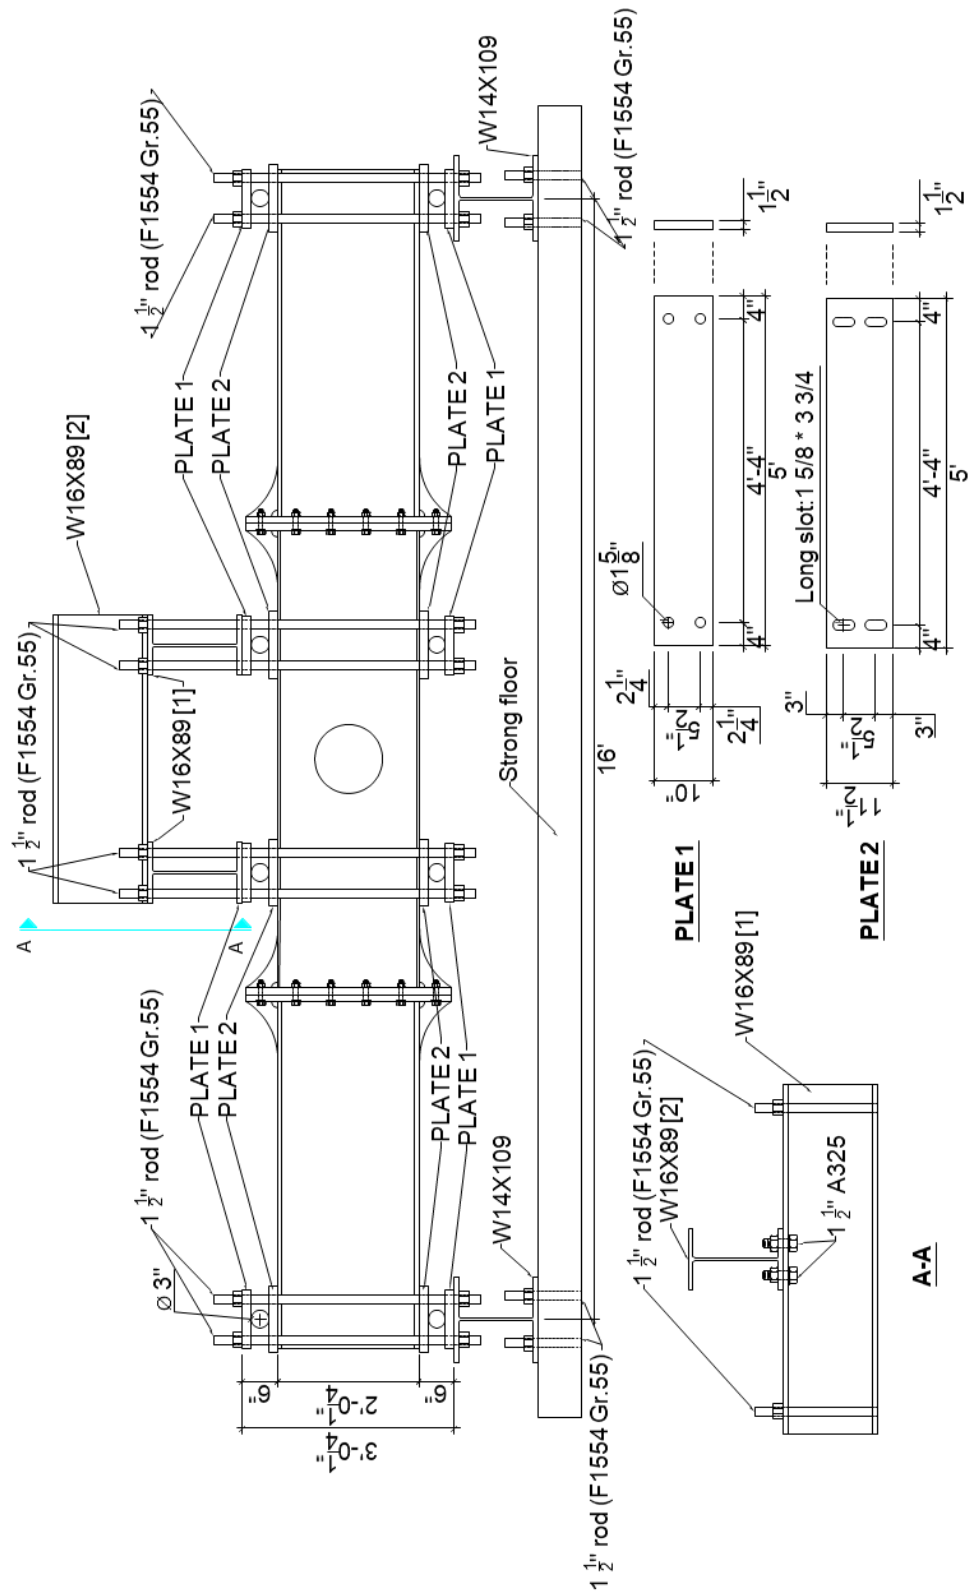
Details of the load/reaction connections in Specimen S1.
